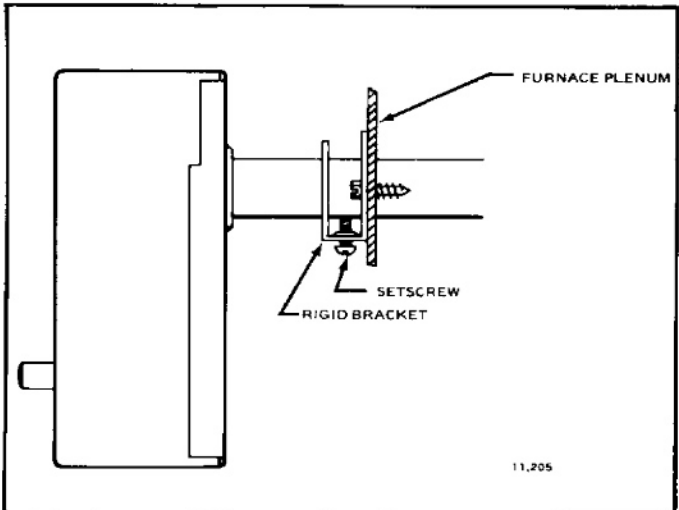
RIGID BRACKET MOUNTING REQUIRES A HOLE 13/16 in. [20.6 mm] DIAMETER FOR ELEMENT INSERTION.
